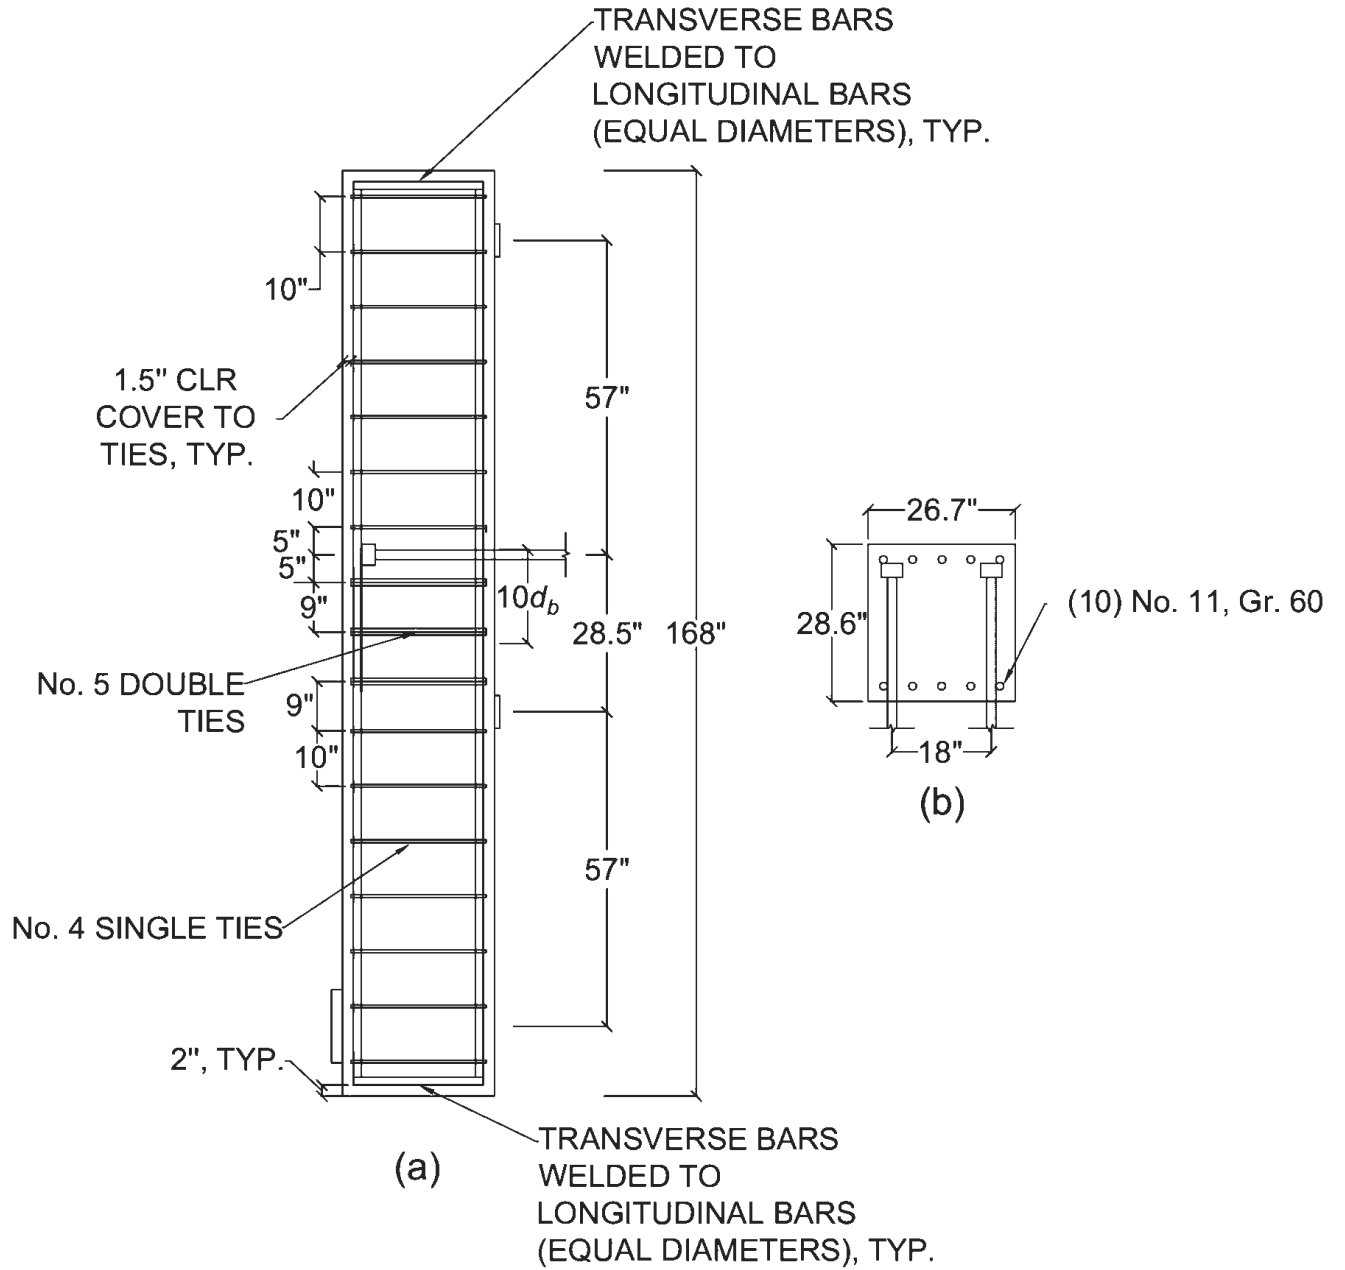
Details of reinforcement layout for No. 14 headed bar specimen 14-16F: (a) elevation, (b) cross-section
